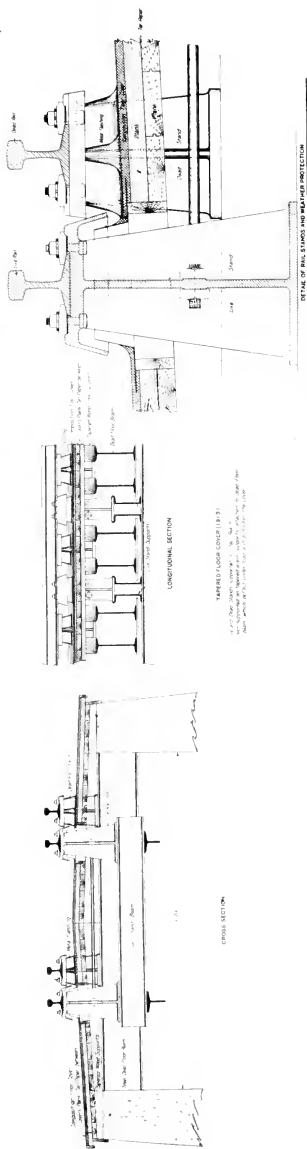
200-Ton Track Scale, C.P.R. Tapered floor cover (1919), cross section, longitudinal section, and detail of rail stands and weather protection.
